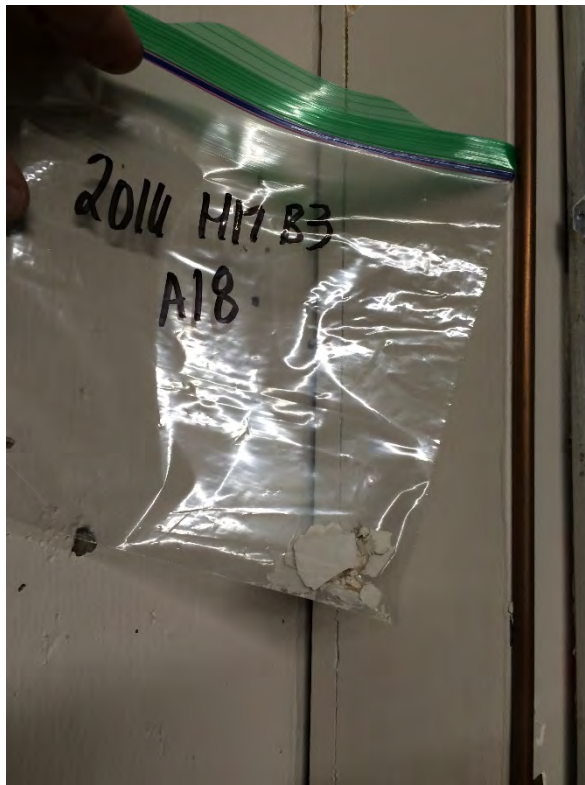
Asbestos sample A18, drywall joint compound collected from wall in H17-B3. No asbestos detected.
